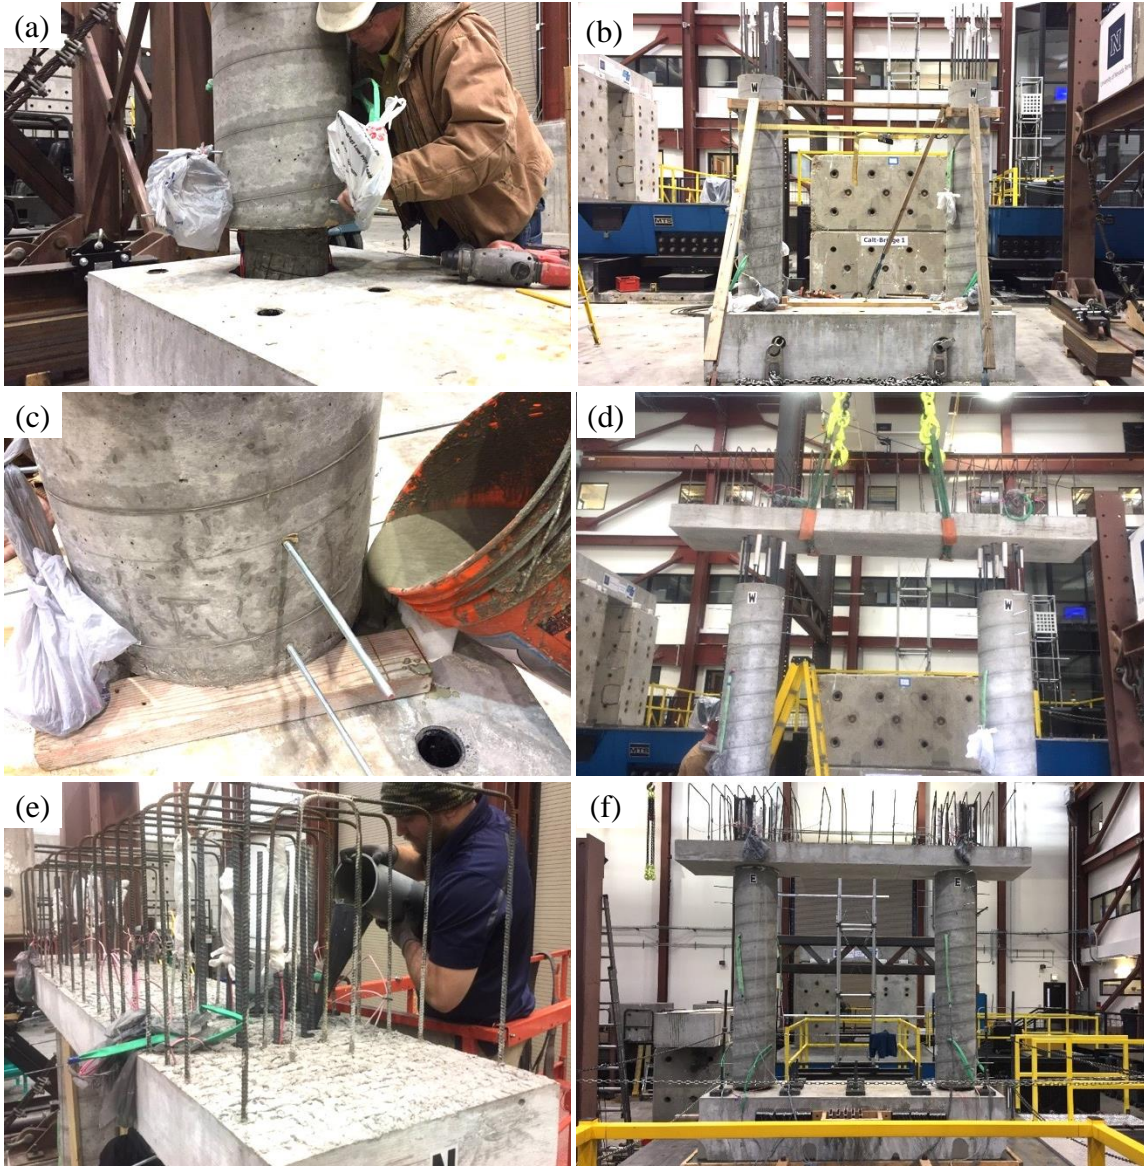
(a) Inserting column into the footing, (b) Securing columns temporarily, (c) Grouting the spacing between the column and the footing, (d) placing precast cap beam on the columns, (e) Grouting cap beam ducts, (f) Precast bent on the shake table (Images by Elmira Shoushtari)
